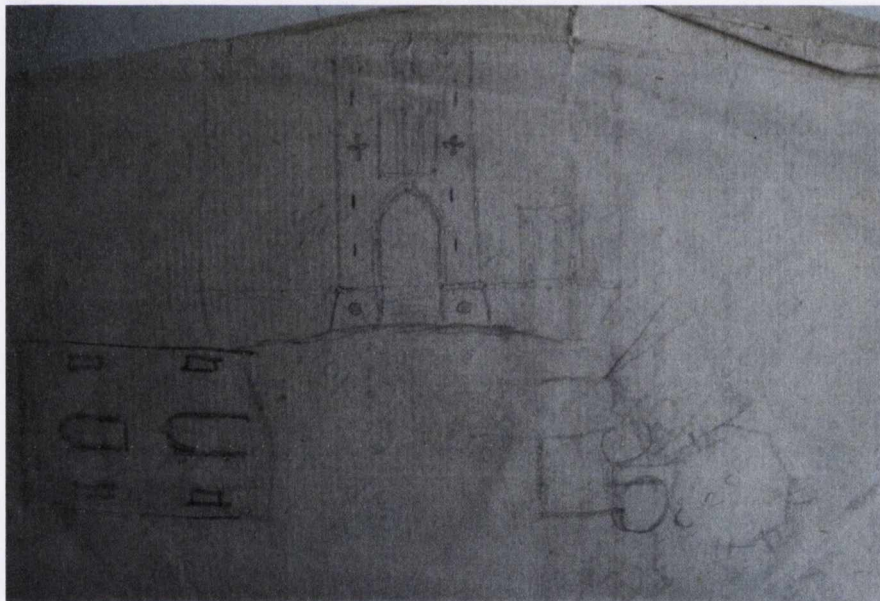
Birr Castle, sketch of proposed gatehouse tower, Laurence Parsons, [1803], Sketch notebook, f. 7v.
